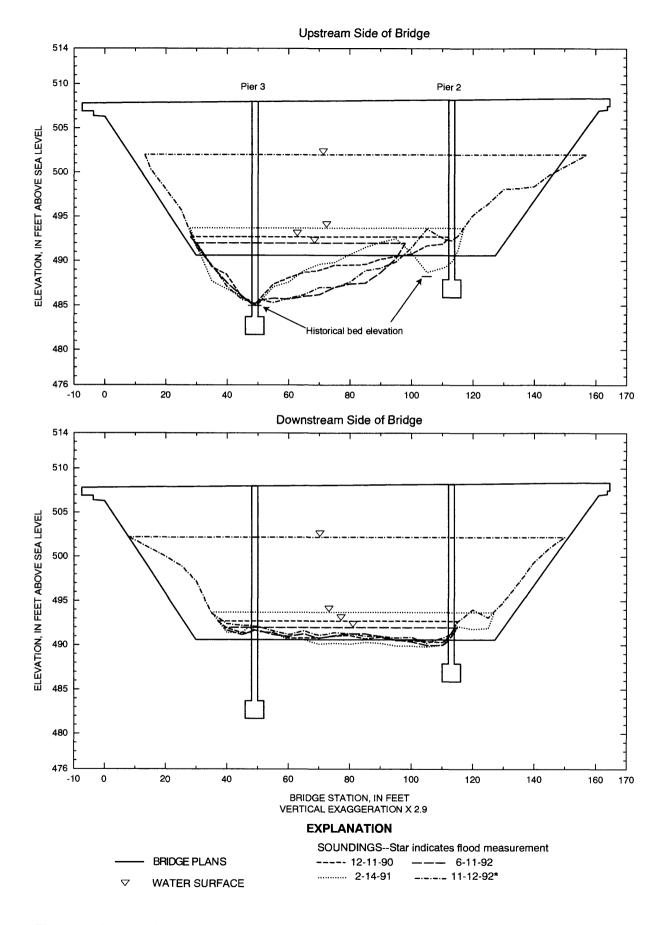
Cross sections showing bed elevations from bridge plans and soundings, State Road 63 (southbound lane) over Little Vermillion River at Newport, Indiana.
